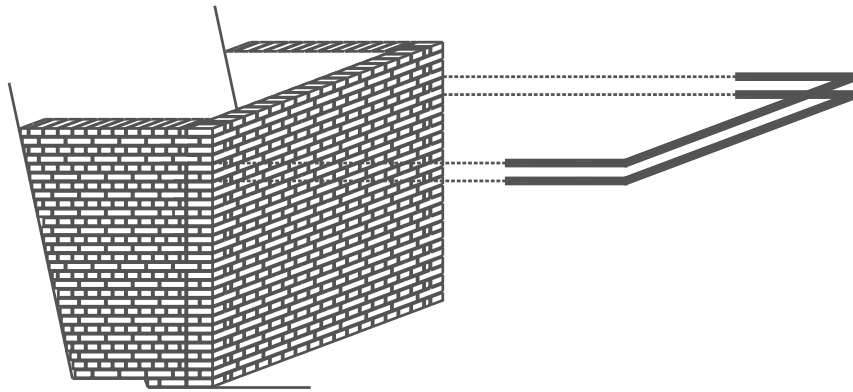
Reinforcement method. Two titanium rods have been installed below the 26th and 24th brick course.
